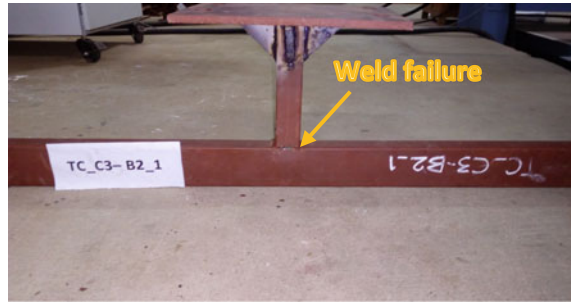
Weld failure of TC_C3-B2_1
